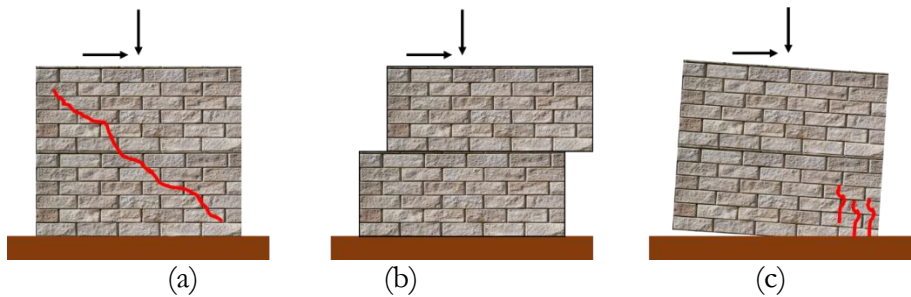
In-plane collapse mechanisms: failure modes in unreinforced masonry walls (a ) Shear crack, (b) Failure by slip, (c) Buckling failure.
